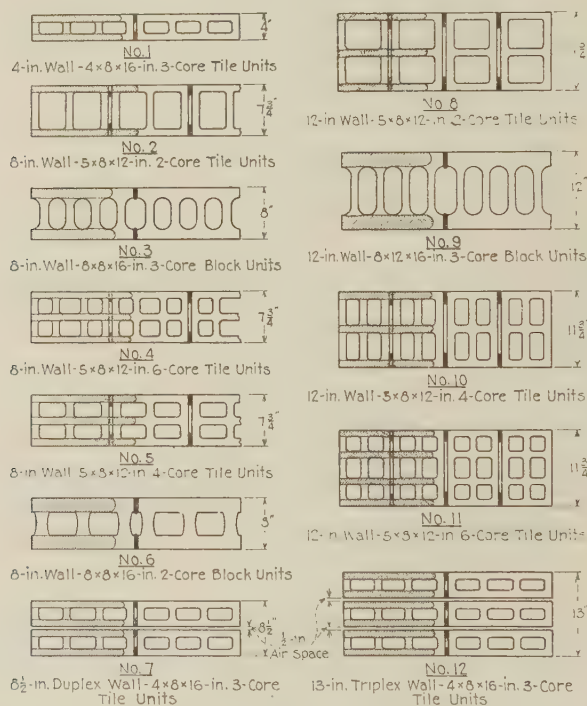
DETAILS OF VARIOUS TYPES OF WALLS
